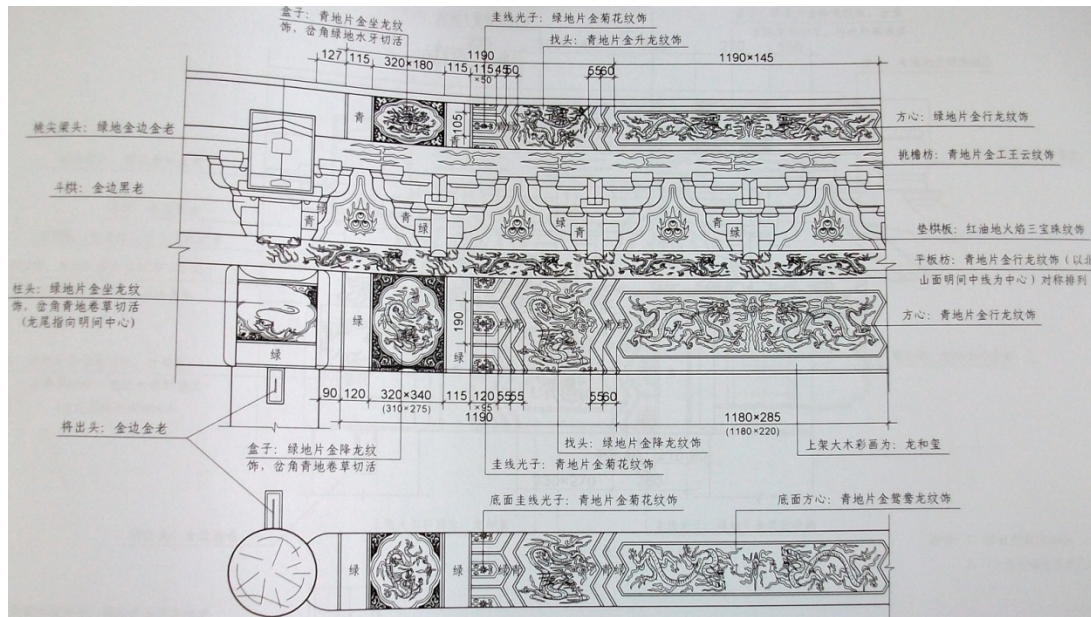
Manual Engineering Drawing (courtesy of Palace Museum)
